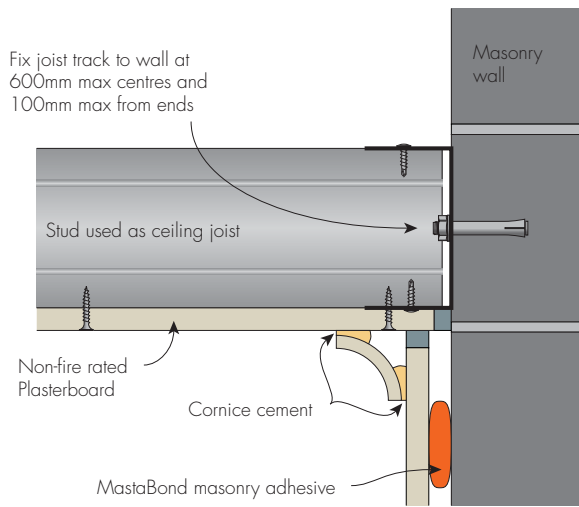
Non-Trafficable Ceiling to Masonry Wall
